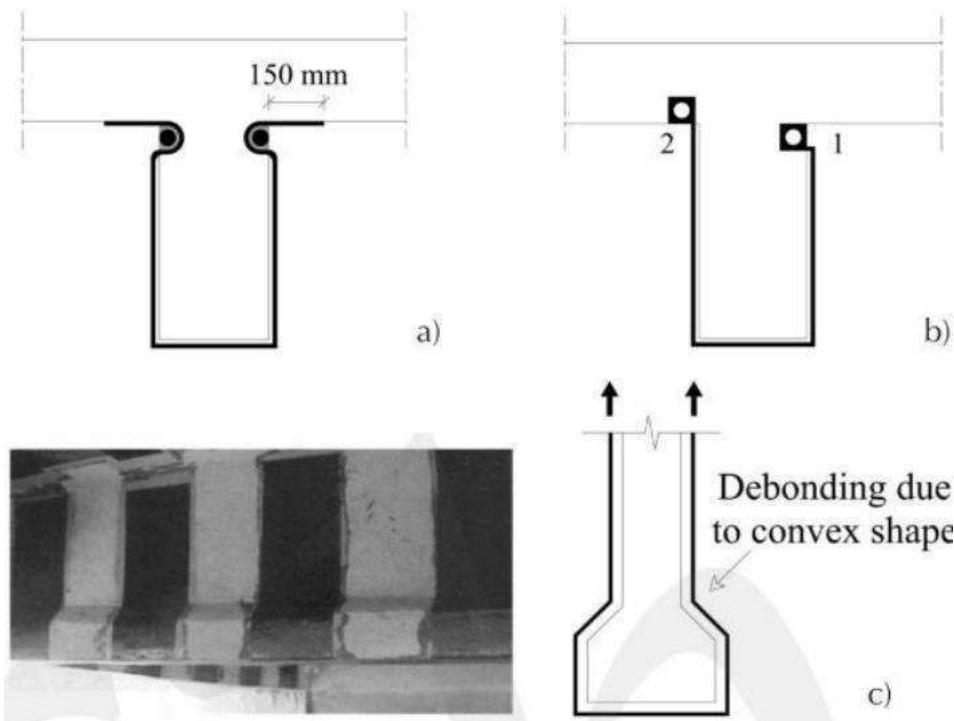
(a)NSM rods as anchors for U-shaped FRP shear strengthening of an RC beam (b)Possible configurations,with 1 being better than 2(c)Extra anchorage needed for I-shape
